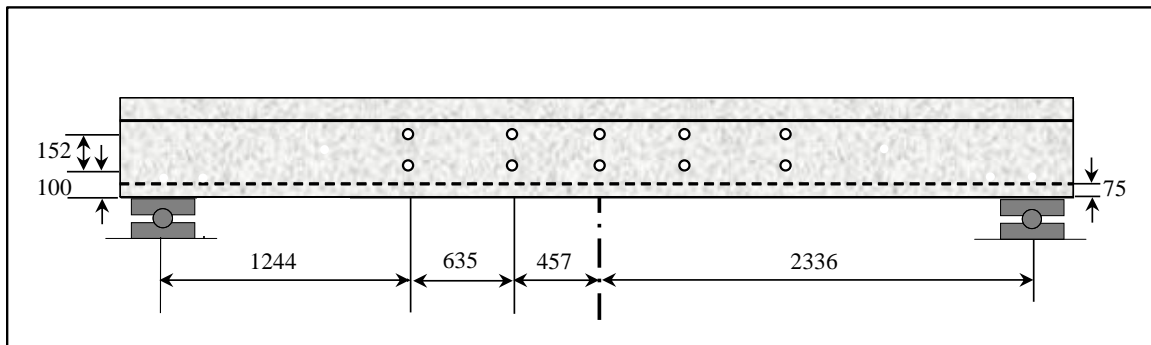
AE sensor layout, dimensions in mm (1 inch = 25.4 mm).
